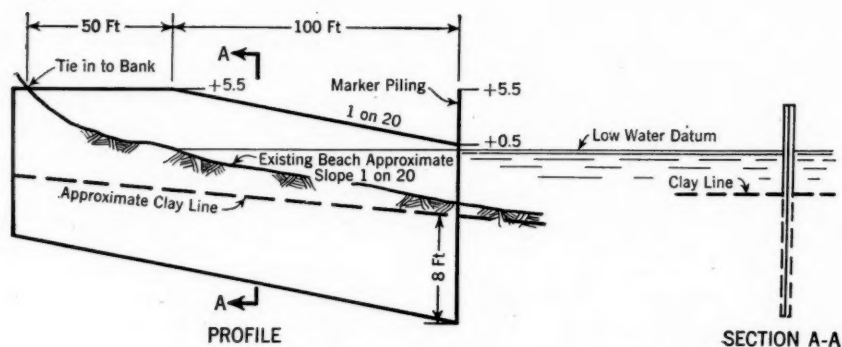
SHEET STEEL PILING GROIN FOR NORTHERN LAKE PLAIN SECTION
